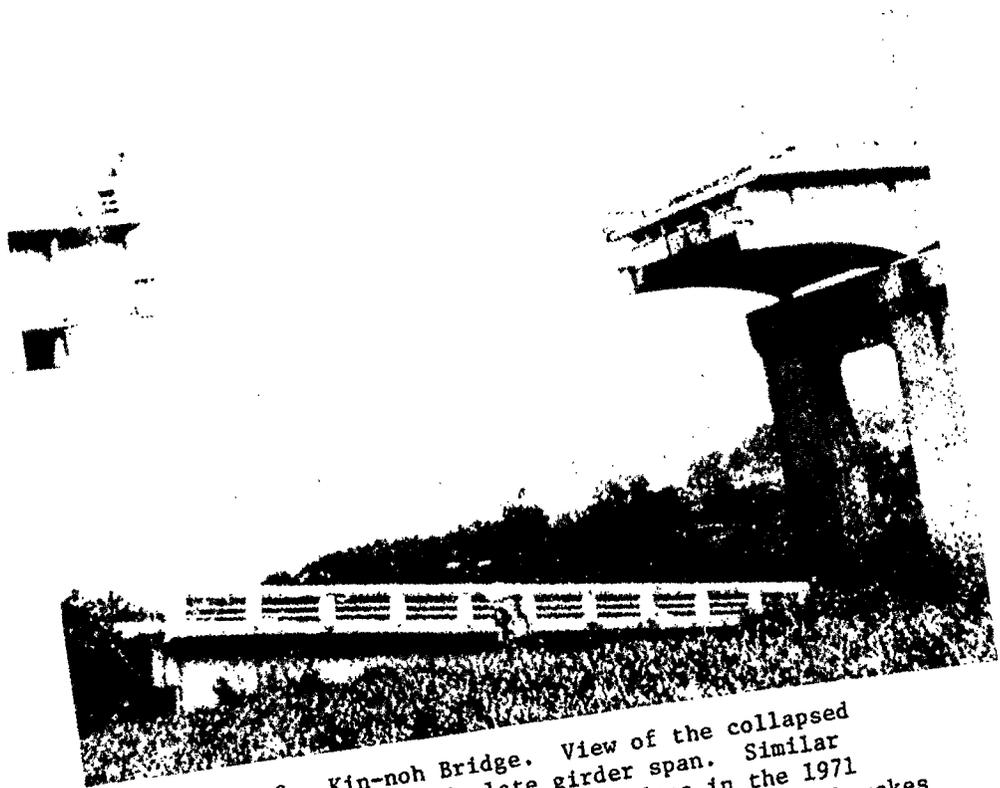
Kin-noh Bridge. View of the collapsed suspended plate girder span. Similar damage occurred to bridges in the 1971 San Fernando and 1976 Guatemala earthquakes because of lack of superstructure restraint and small bearing seats. Suspended spans are no longer used in seismically active areas. (Courtesy J.M.O.C.)
